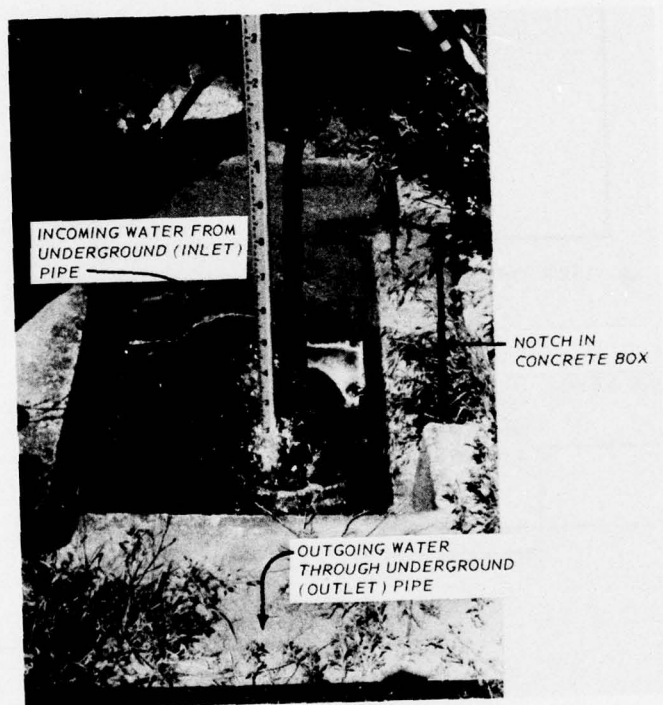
Underground pipe and concrete box outlet of irrigation system (system not in use)
